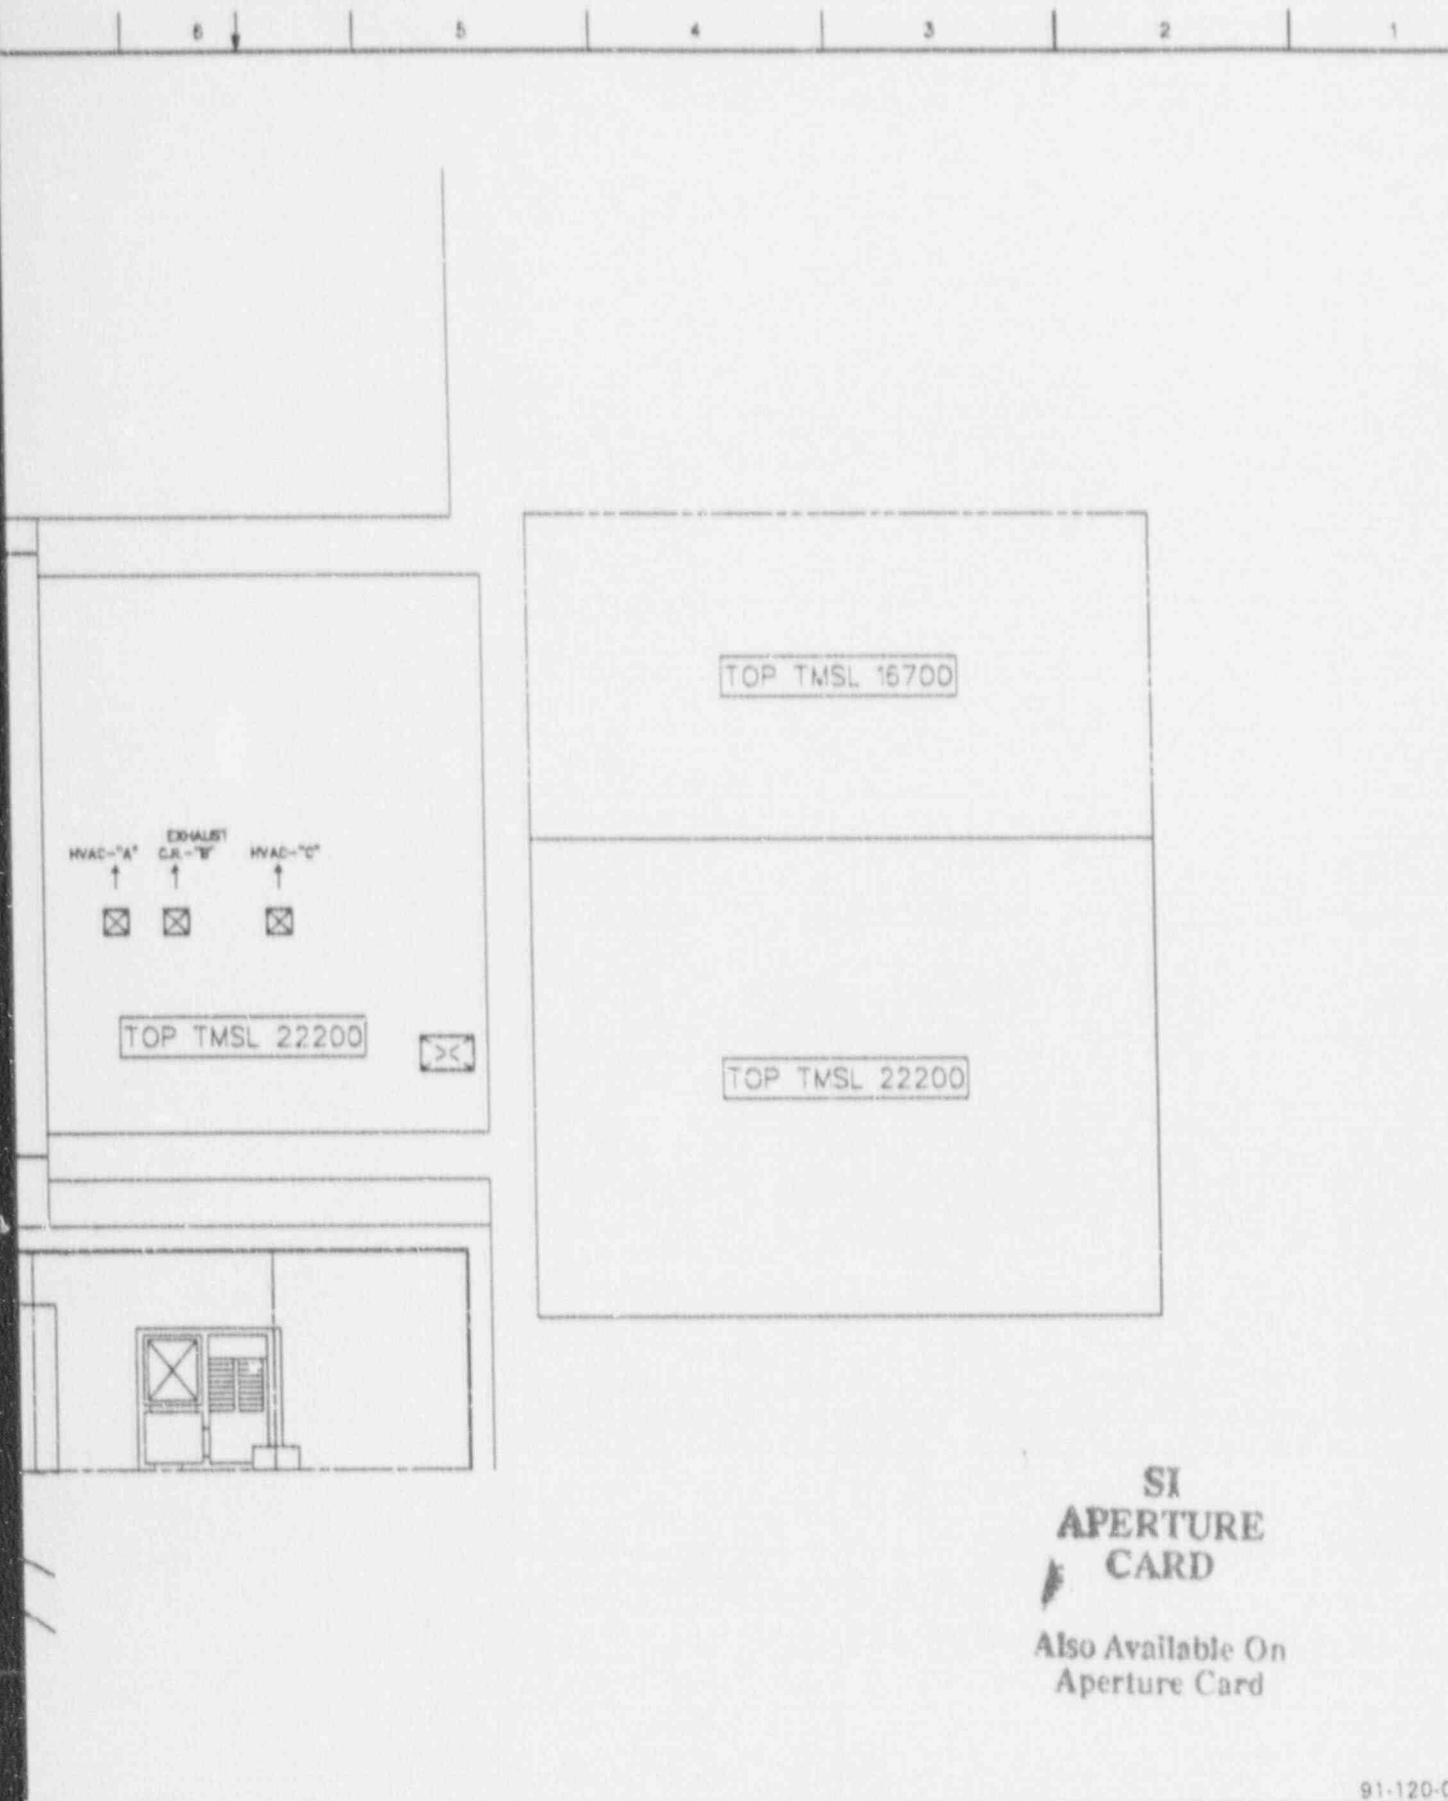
CONTROL AND SERVICE BUILDING, ARRANGEMENT
